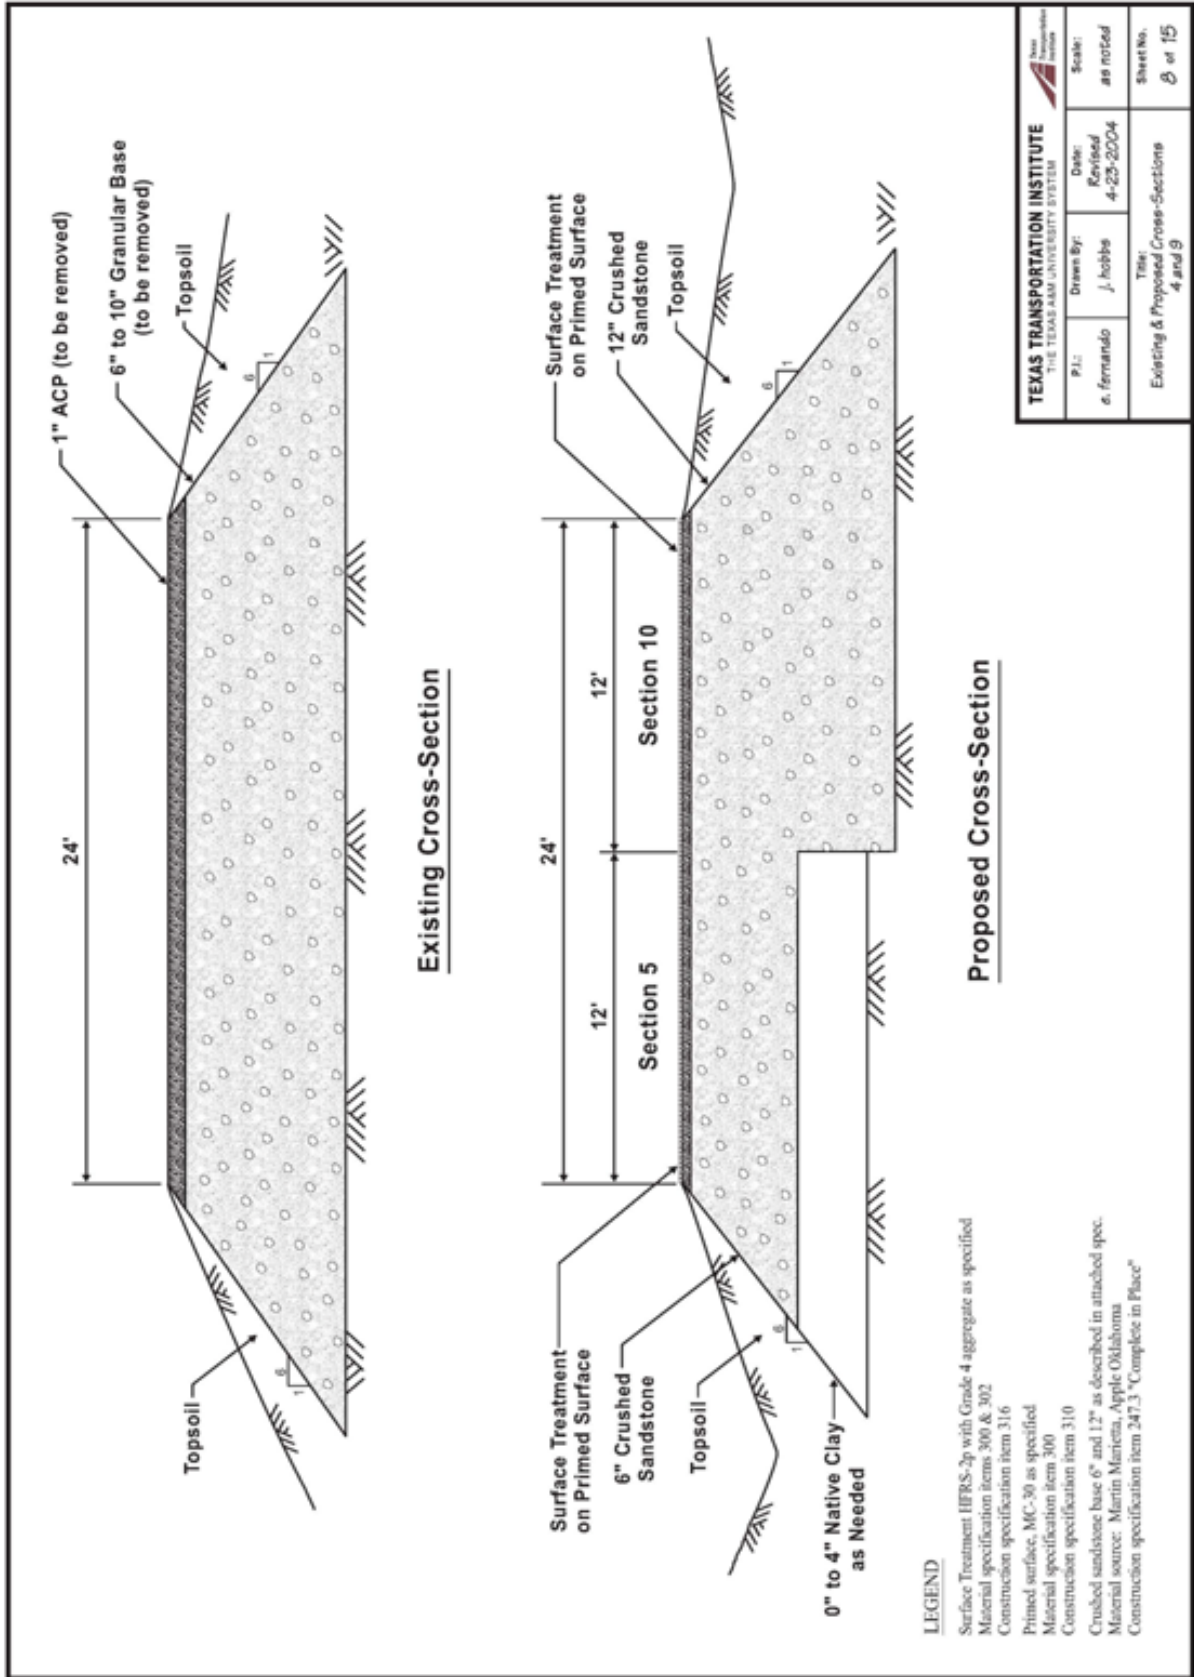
Existing and Proposed Cross-Sections for Sections 5 and 10.
